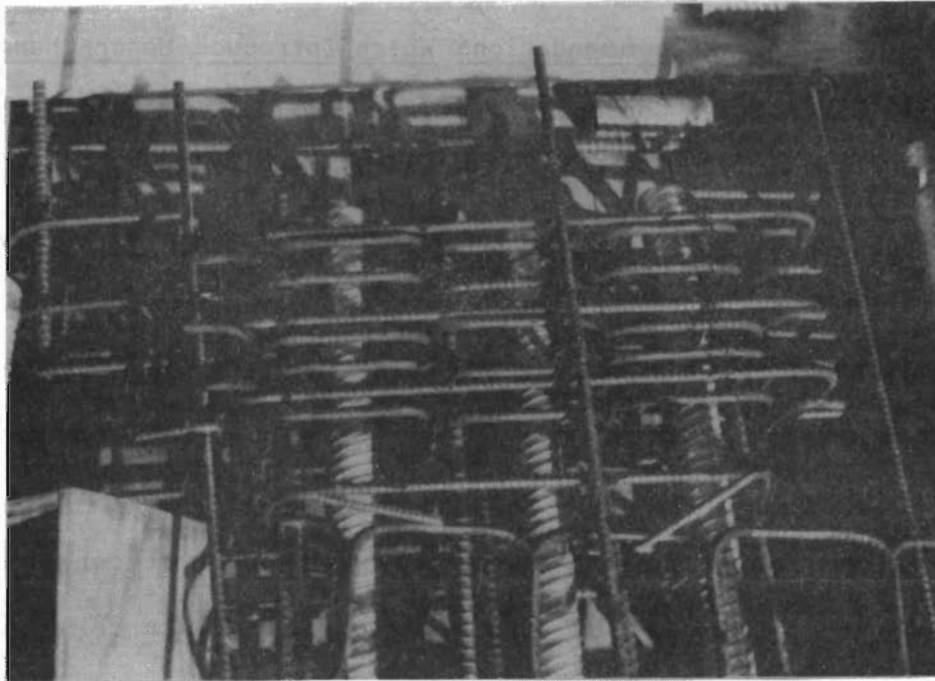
W-bar bursting reinforcement and rebar congestion in wing anchorage zone
